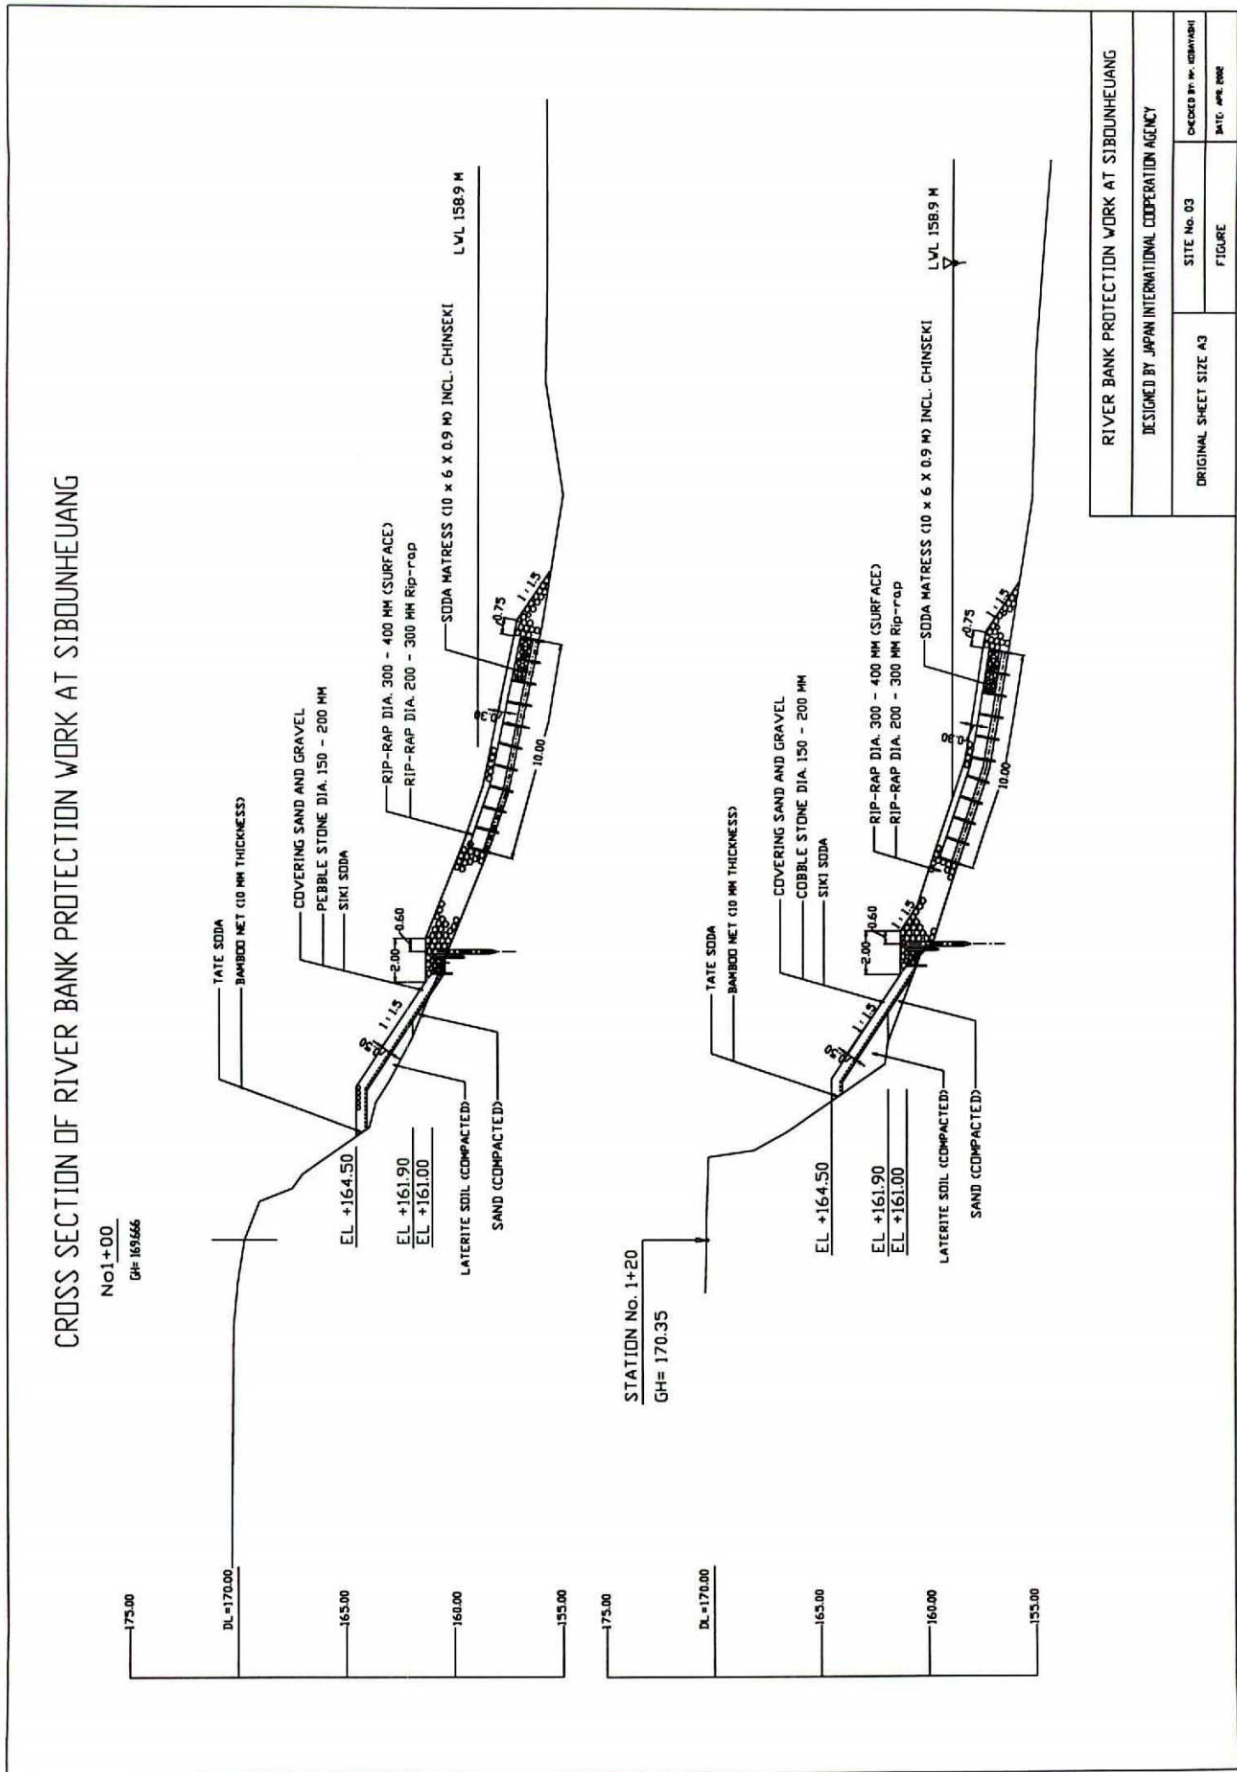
(2/5) Cross Section of River Bank Protection Work at Sibounheuang Site
